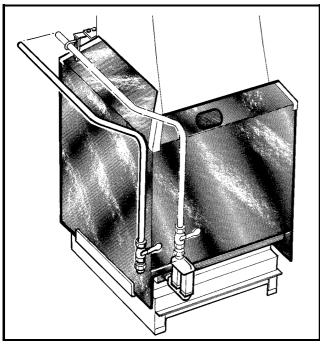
shows the pipe clamp fitted to Warmwell 95, 120 and 140kW boilers.
